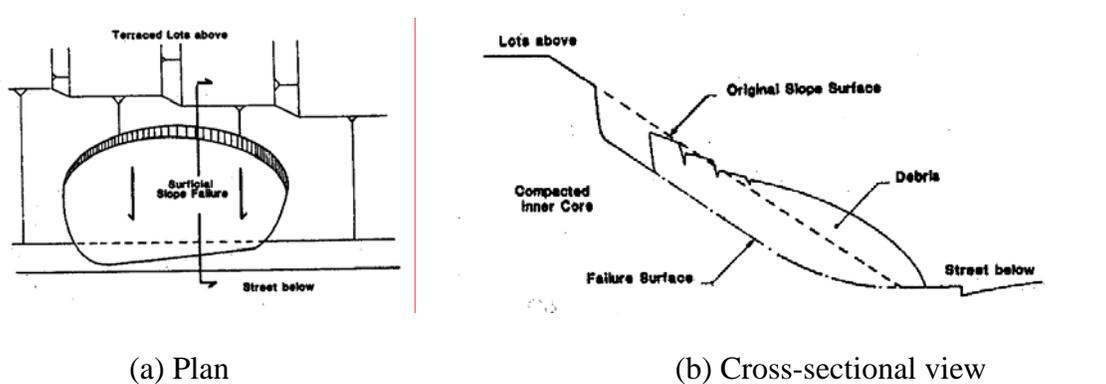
Illustration of typical surficial slope failure (Day, 1997).
